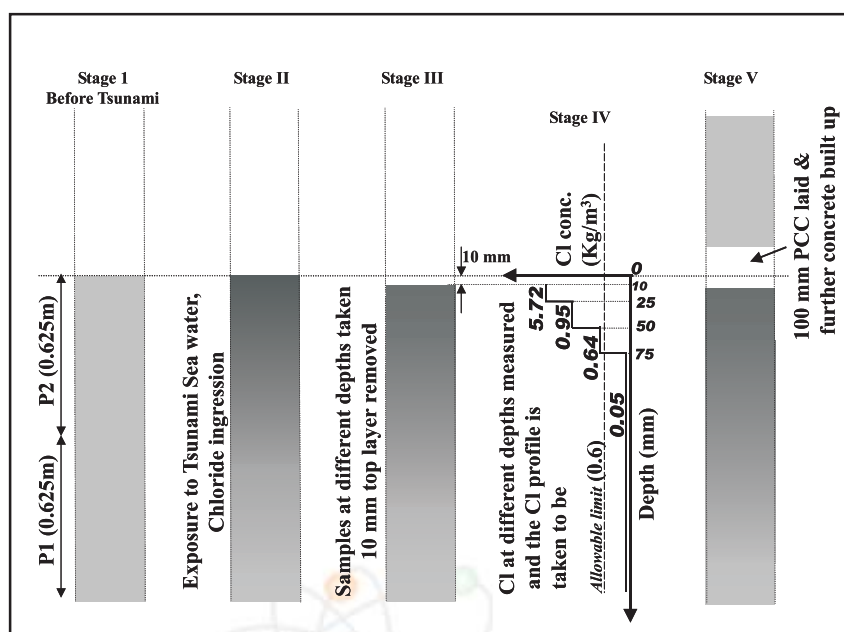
Schematic Elevation View of a section of the concrete built-up
